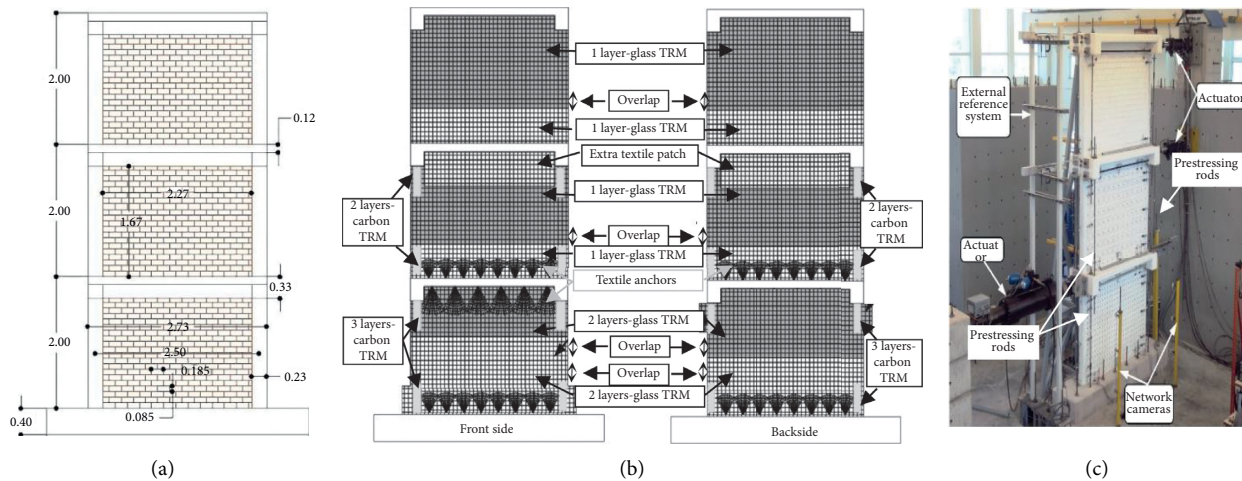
(a) Geometry of the masonry-infilled RC frame and (b) the strengthening scheme: textile anchors of the first and the second storeys and the TRM layer on the faces of masonry infill at the first, second, and third storeys. (c) Test setup. [31].
